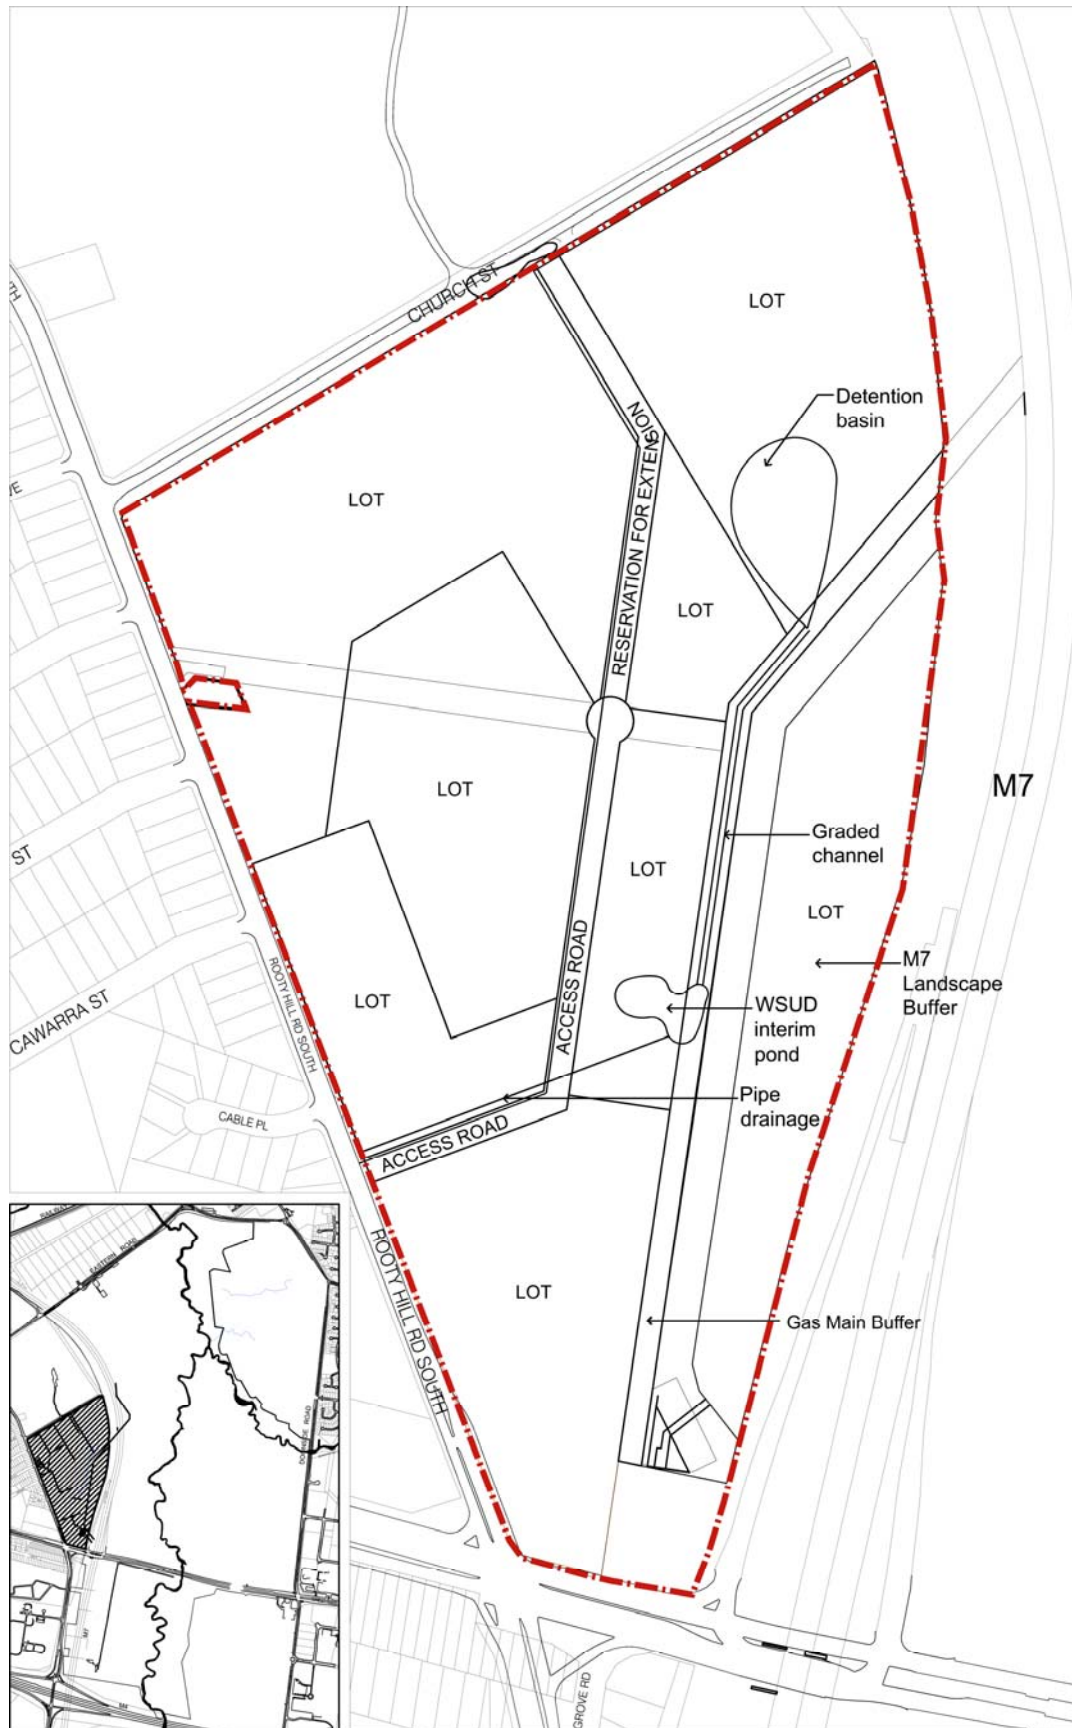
Preliminary Subdivision Plan. First Subdivision and Early works will establish super lots to facilitate future development under the Concept Plan.
